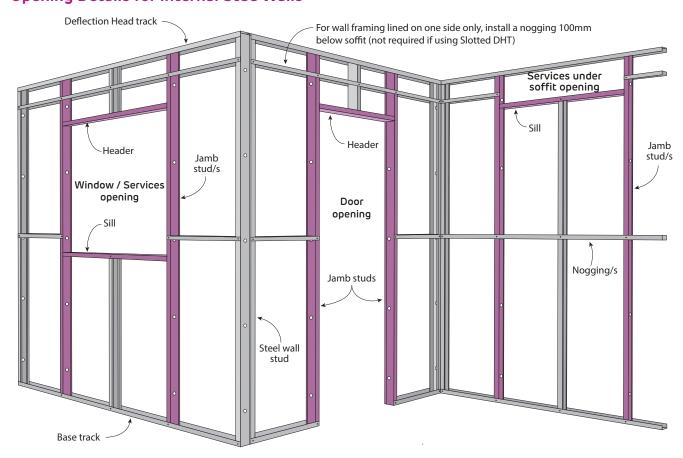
Internal Steel Frame Wall with Window and Door Openings
